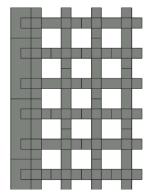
Typical isometric (30°) arrangement of EC Geoblock gravity retaining wall
